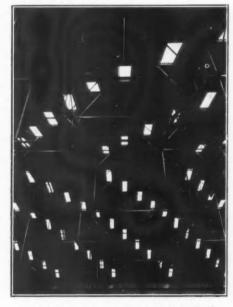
No. 4 Shed. Royal Victoria Dock. Span 200-ft. bottom boom of arch truss is a m.s. channel. Remainder of roof is of tubular steel. Roof lights are staggered for even light distribution.
